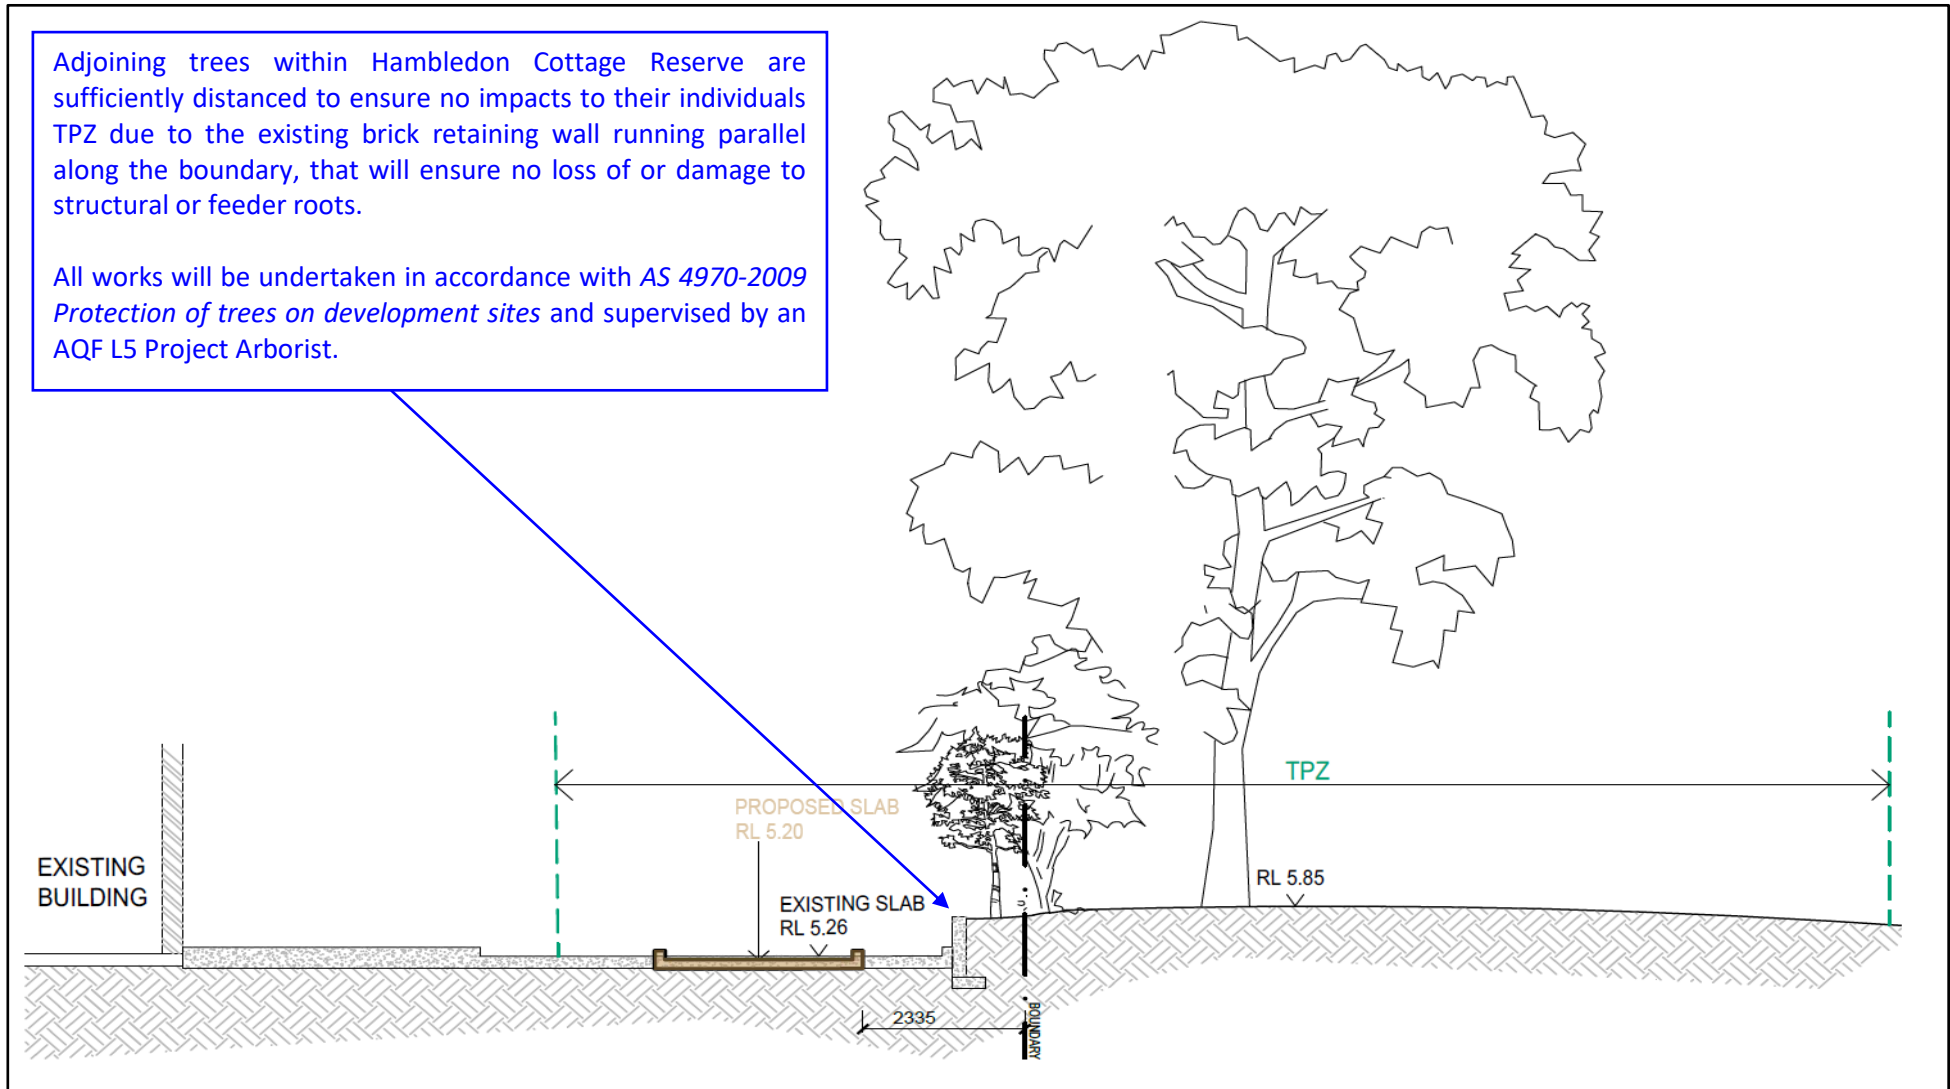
Shows the brick retaining wall location ensuring the safe protection of adjoining trees.
